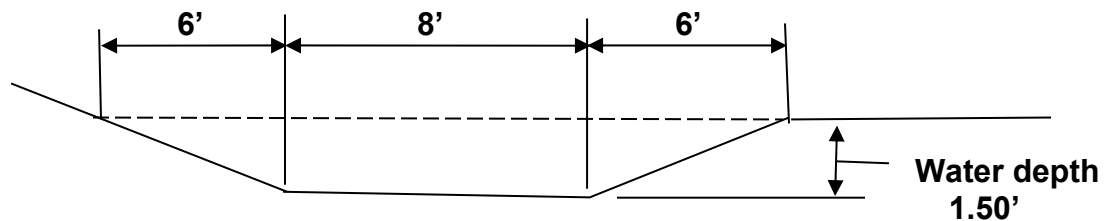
Cross-Section, Drainage Channel Section Four
